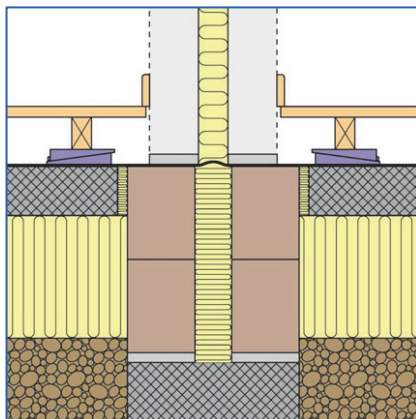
Example of Danish heavy cavity wall construction for new terraced housing fulfilling the Danish Building Regulations 2010. From [7], where more information about materials and dimensions can be found.
